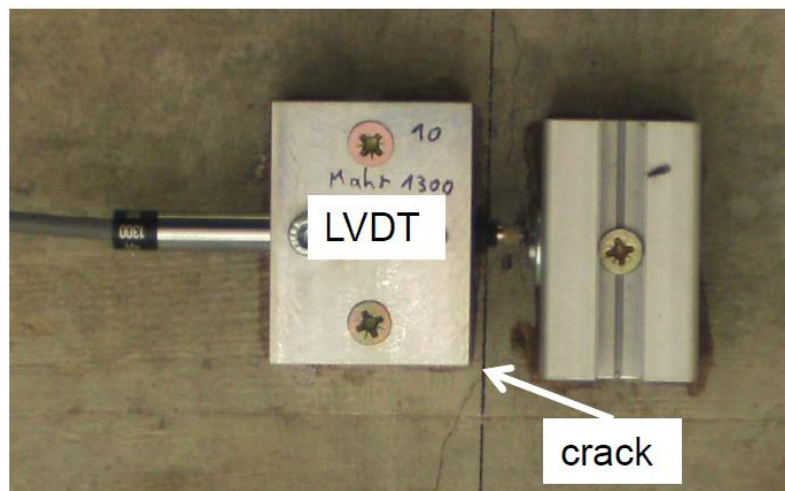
LVDT Sensor Installed under the Bridge and Existing Crack in the Bridge Structure (reprinted from Lechner et al. 2010).
